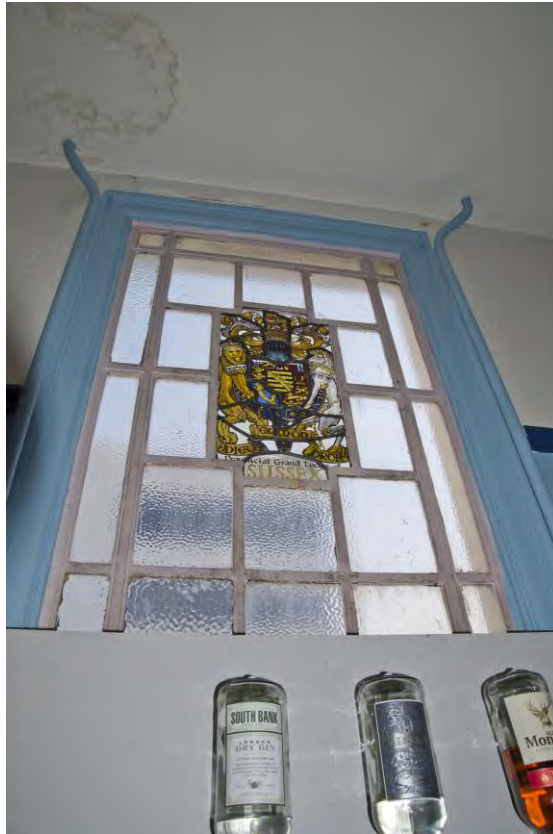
No. 25 Queen’s Road, Phase 3 ground floor window to front elevation, site of former billiard room. View looking east.
